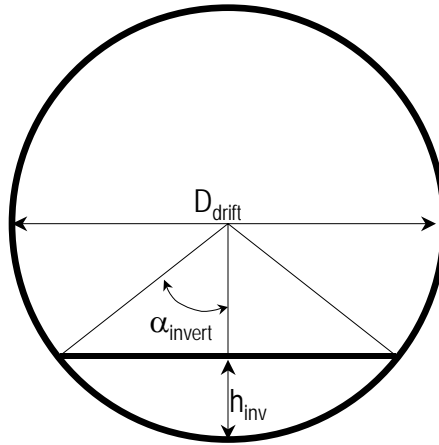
Calculation of Exposed Wall Perimeter
